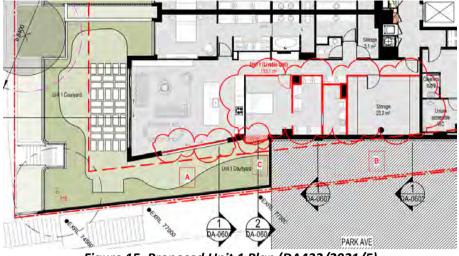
Proposed Unit 1 Plan (DA432/2021/5)
